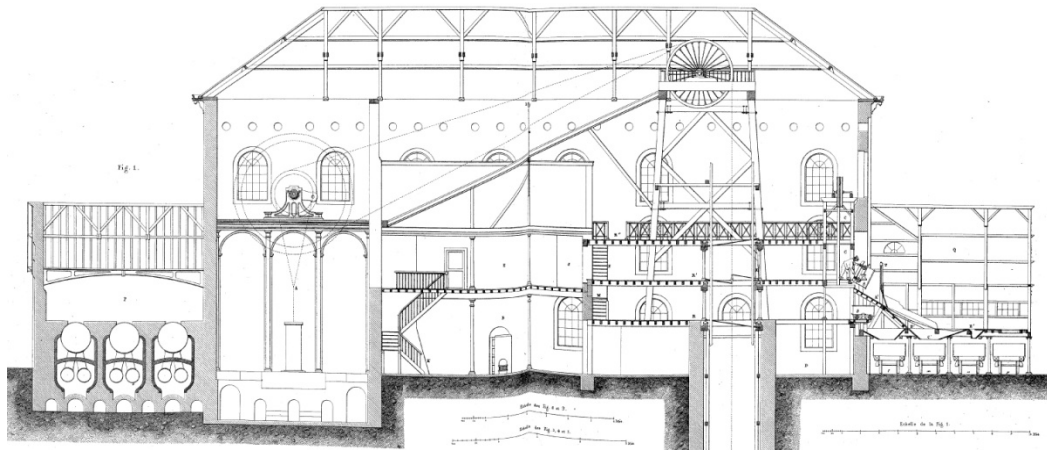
Section of the building of pit n.12. Source: Atlas de la Société de l'Industrie Minérale, planche XII.
